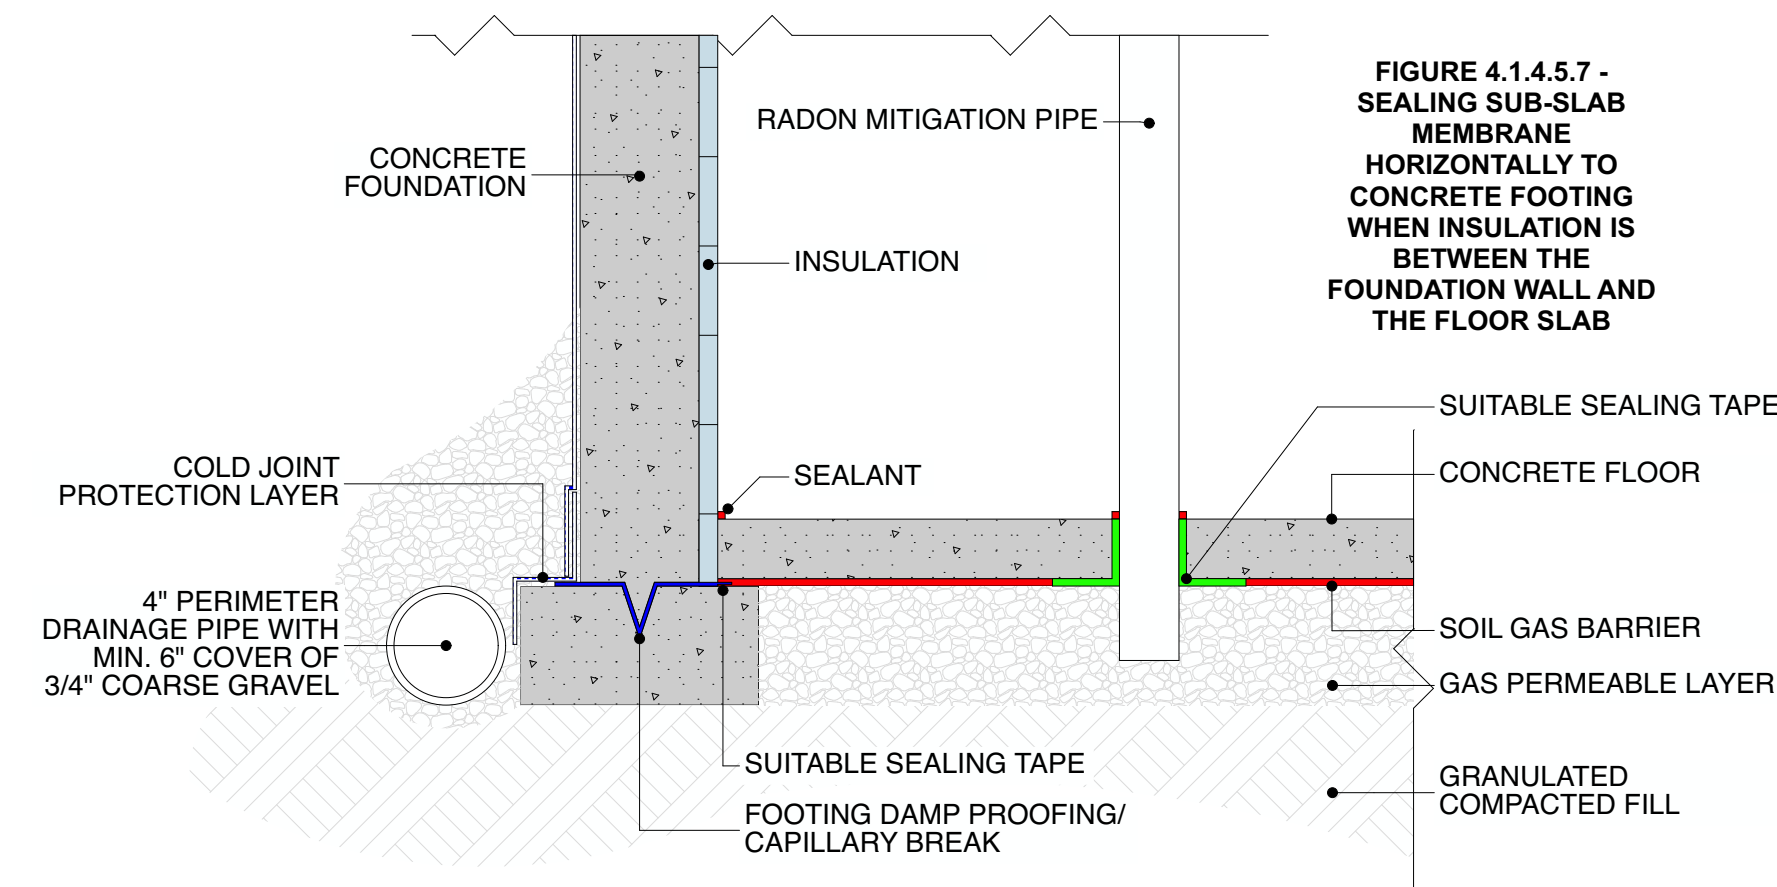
SEALING SUB-SLAB MEMBRANE HORIZONTALLY TO CONCRETE FOOTING WHEN INSULATION IS BETWEEN THE FOUNDATION WALL AND THE FLOOR SLAB
